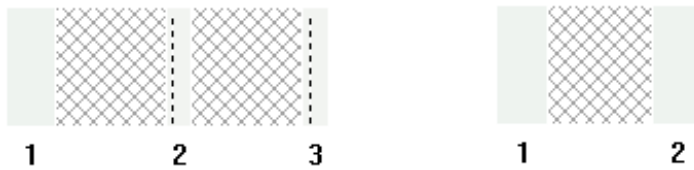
Example of Sill Cross Section of a Non-Residential Window
